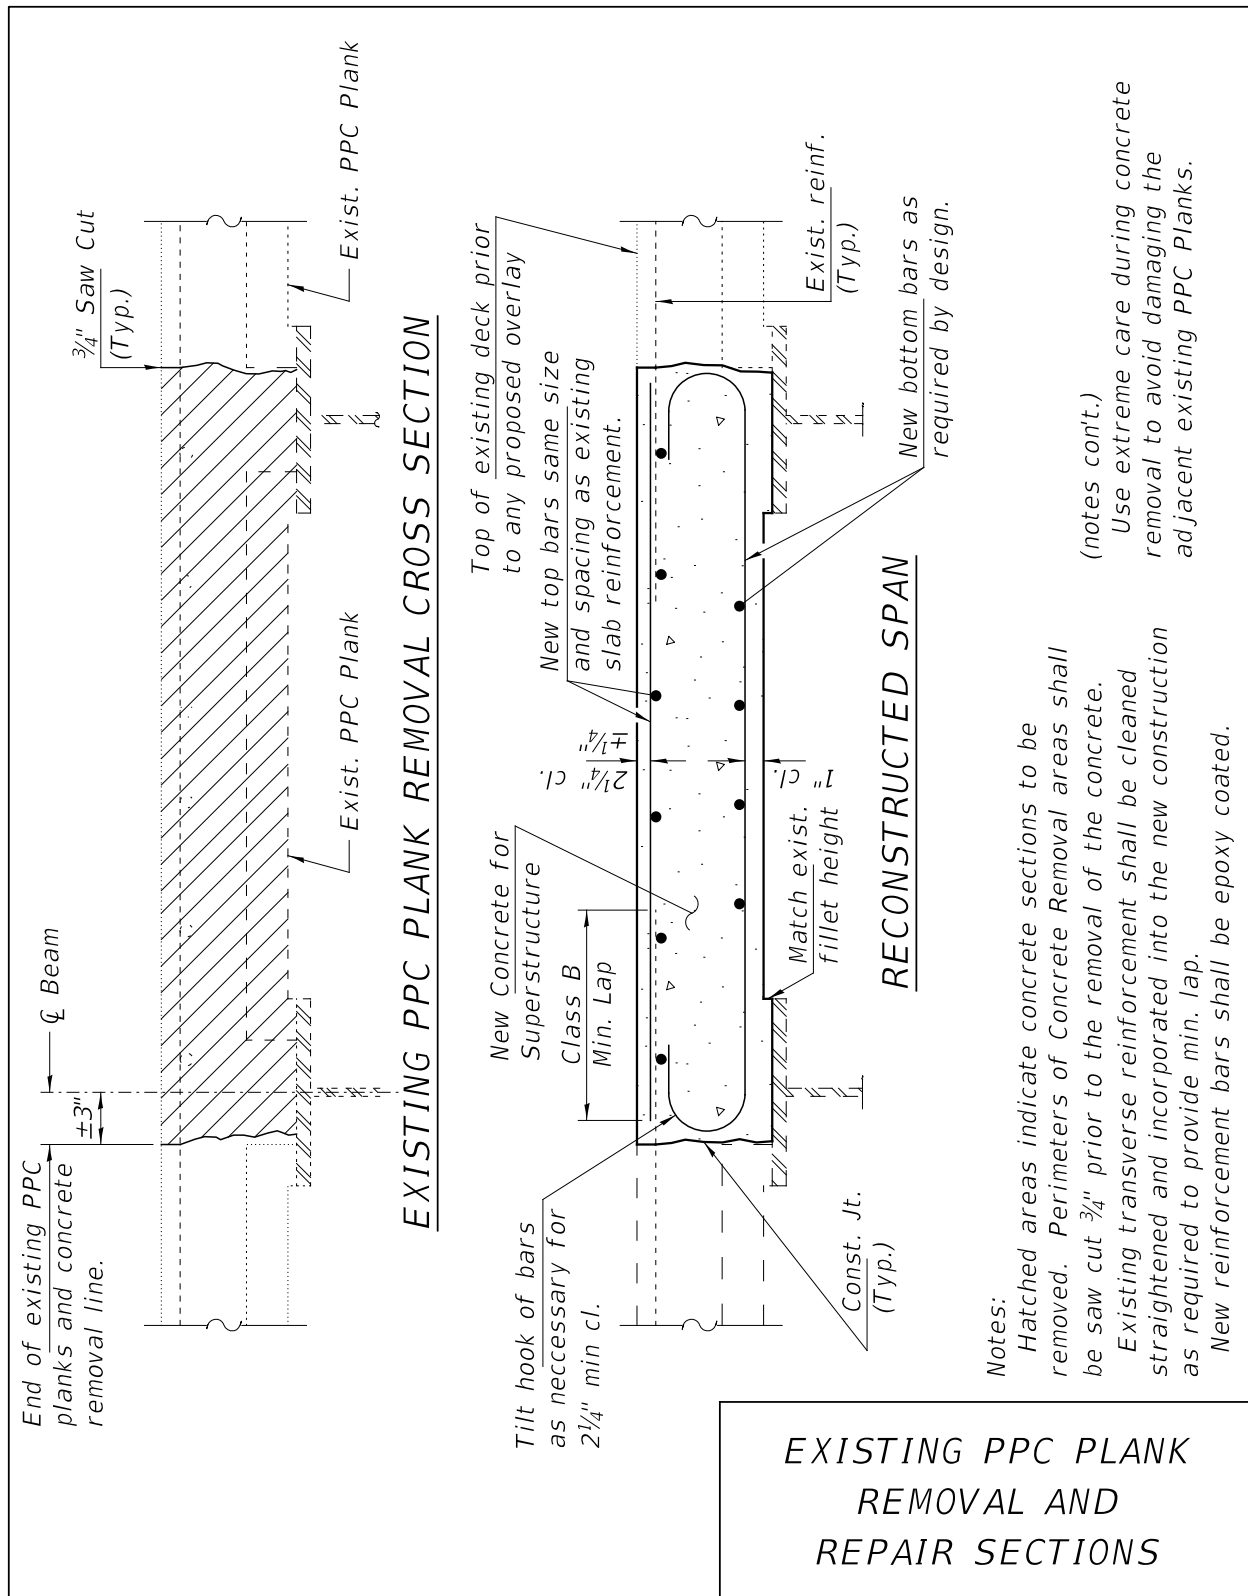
Existing PPC Plank Removal and Repair Sections
